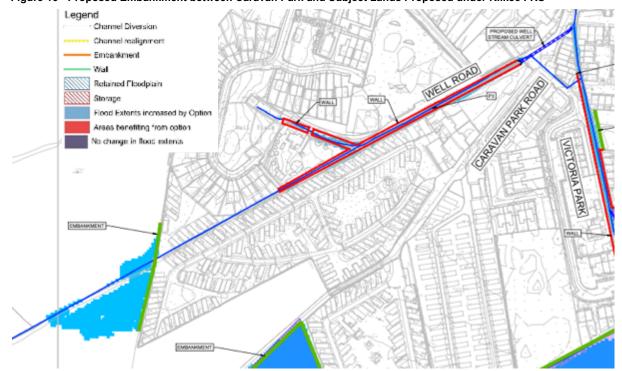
Proposed Embankment between Caravan Park and Subject Lands Proposed under Kilkee FRS
